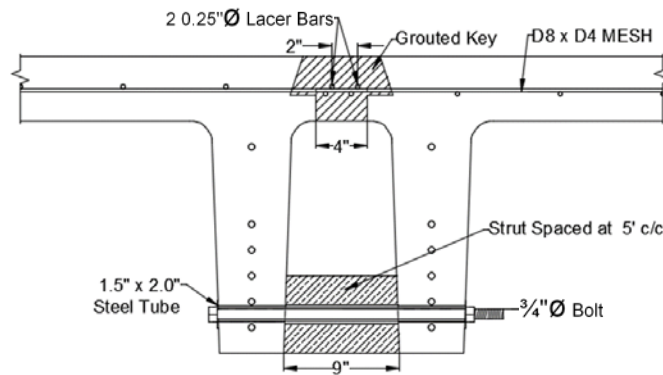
Joint Details of the “Proposed” Specimen (2nd Mesh Not Shown)
